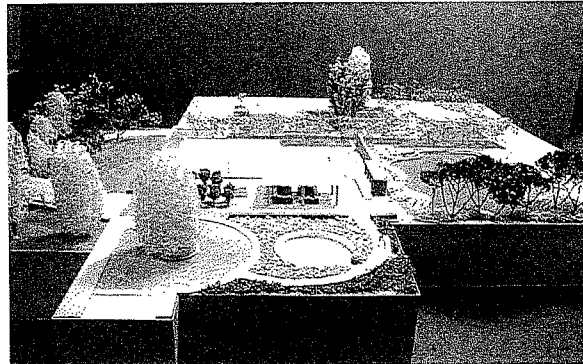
Cul de Sac on 34th Avenue, Site Model
